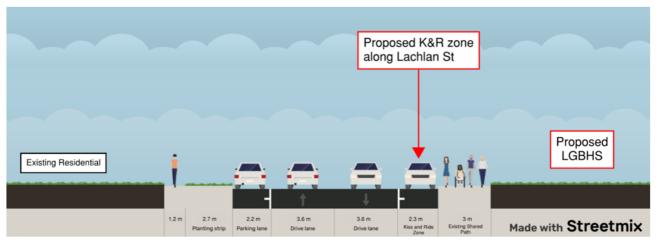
Proposed Cross-Section at Kiss & Ride Zones on Lachlan Street
